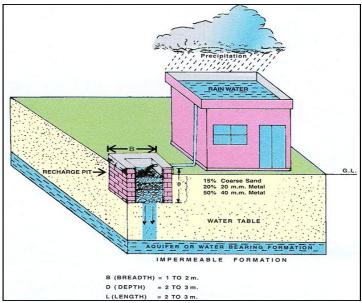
Schematization of roof-top rainwater harvesting through recharge pit [7]
